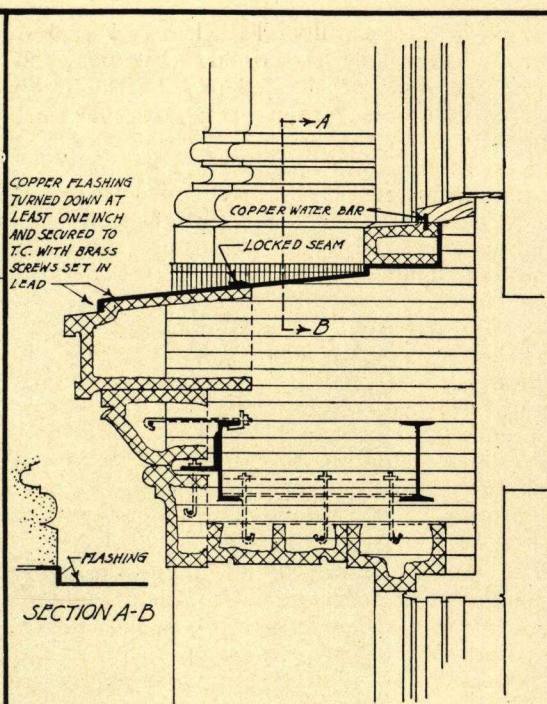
When a Terra Cotta balcony or similar projecting feature serves as the base for columns, pilasters, or other projections above the floor of the balcony, the flashing is applied as shown in Fig. 64. It is placed in a similar manner to that described for Fig. 63 except that the cap flashing placed under the Terra Cotta window sill is also carried around under the column bases, into the joints of which it is set (as shown by the section in the lower left-hand corner), and built in as the masonry progresses, and before the base flashing and that of the balcony floor is in position. Afterwards the cap flashing is turned down over the base flashing at least 1 inch and the seam soldered.
